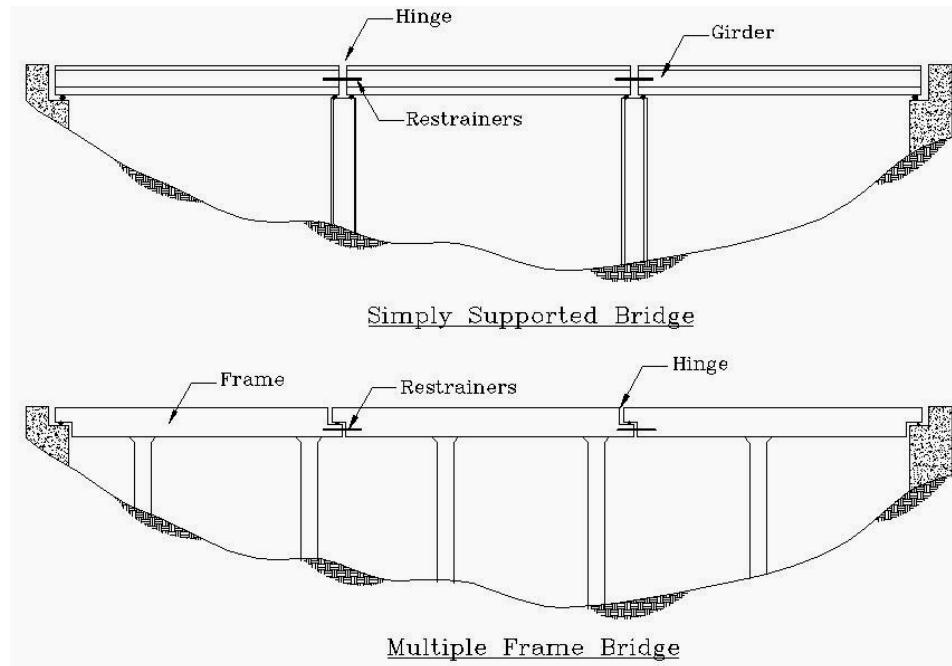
Schematic showing the layout of simply supported and multiple frame bridges with restrainers installed.
